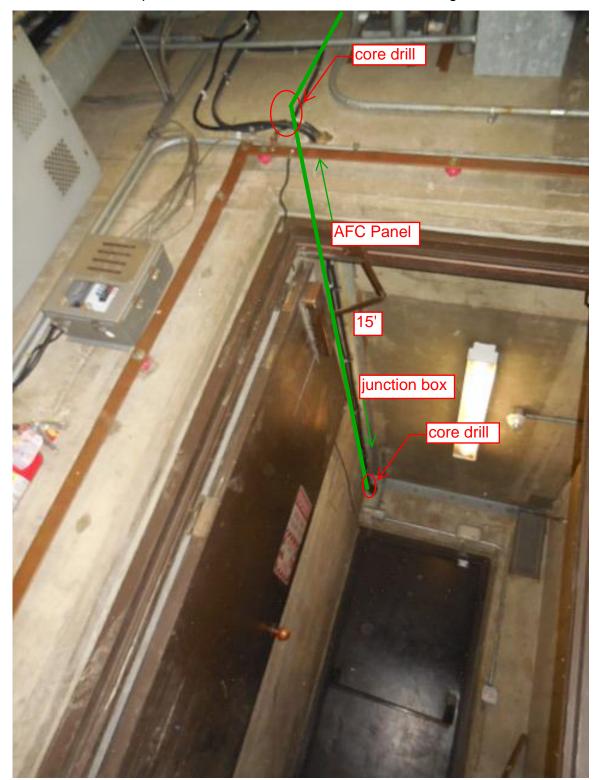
Proposed conduit run from Room C101 entering Room C106
